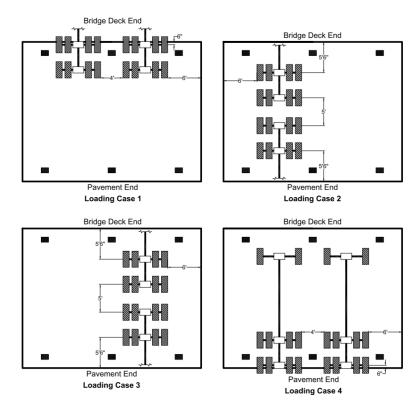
Load Cases and Truck Locations for Bridge A7890
